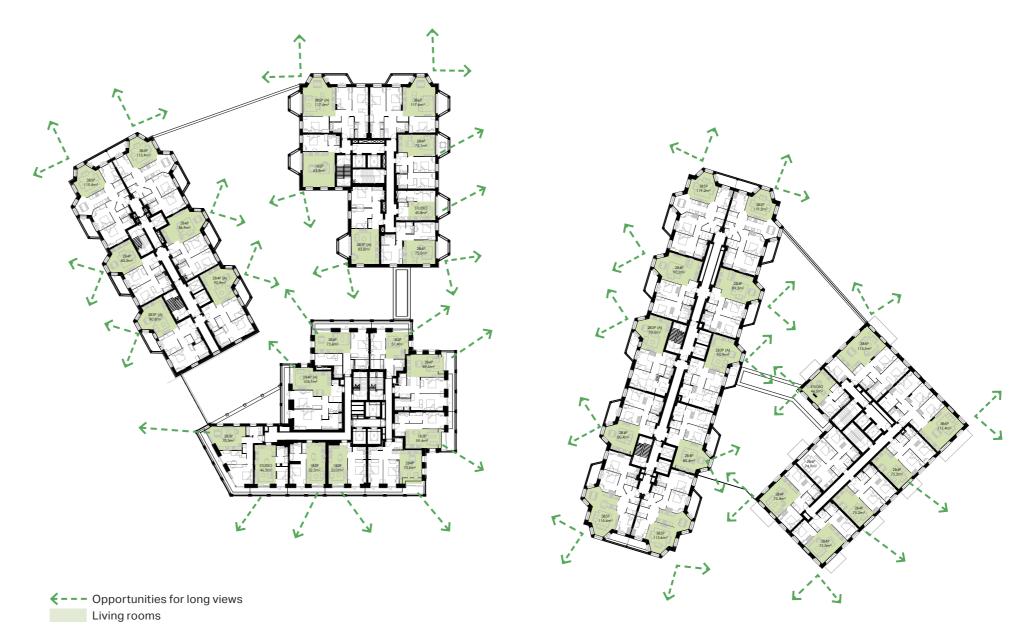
Typical floor highlighting the location of Living rooms and potential for long views (Illustrative Scheme)
